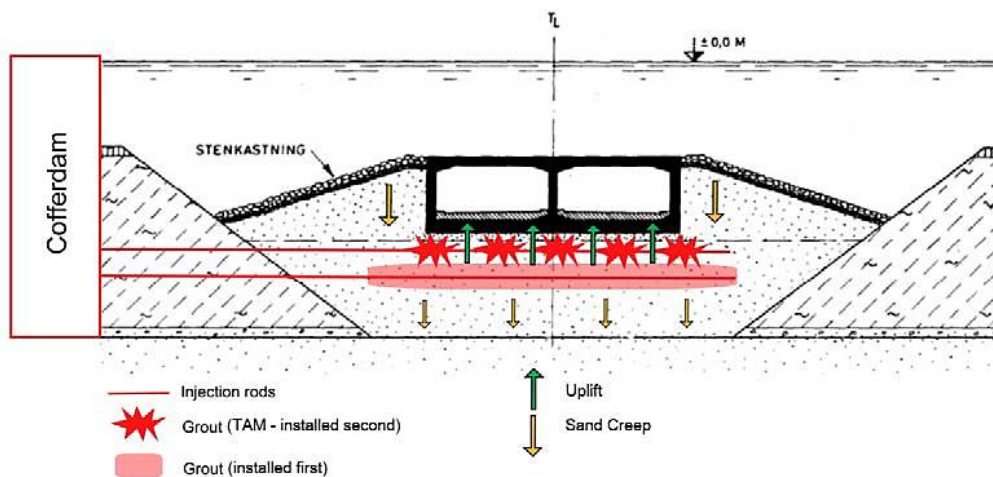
Cross-sectional view of the horizontal compensation grouting for the Limfjord Tunnel (ATKINS et al., 2019).
